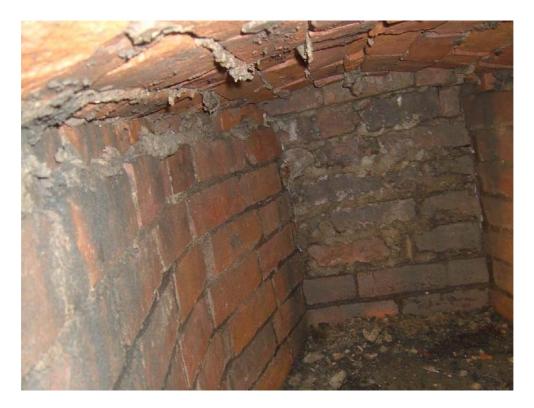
, Area 8: brick vault, 806, interior, west end with rough mortared access
